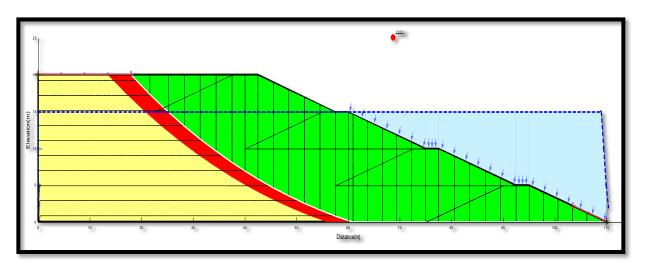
Embankment cross section for 1:3 slope at 15 m water level
